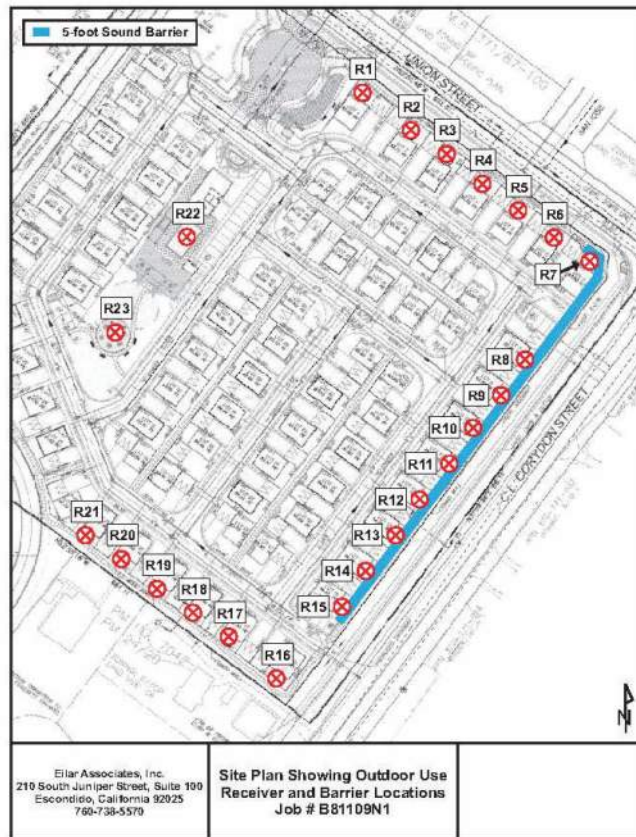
Site Plan Showing Outdoor Use Receiver and Barrier Locations
